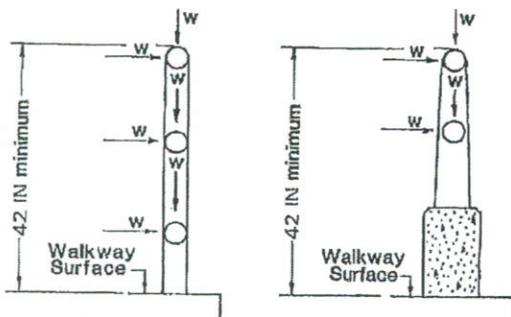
Pedestrian Railing Loads—To be used on the outer edge of a sidewalk when highway traffic is separated from pedestrian traffic by a traffic railing. Railing shape illustrative only.
